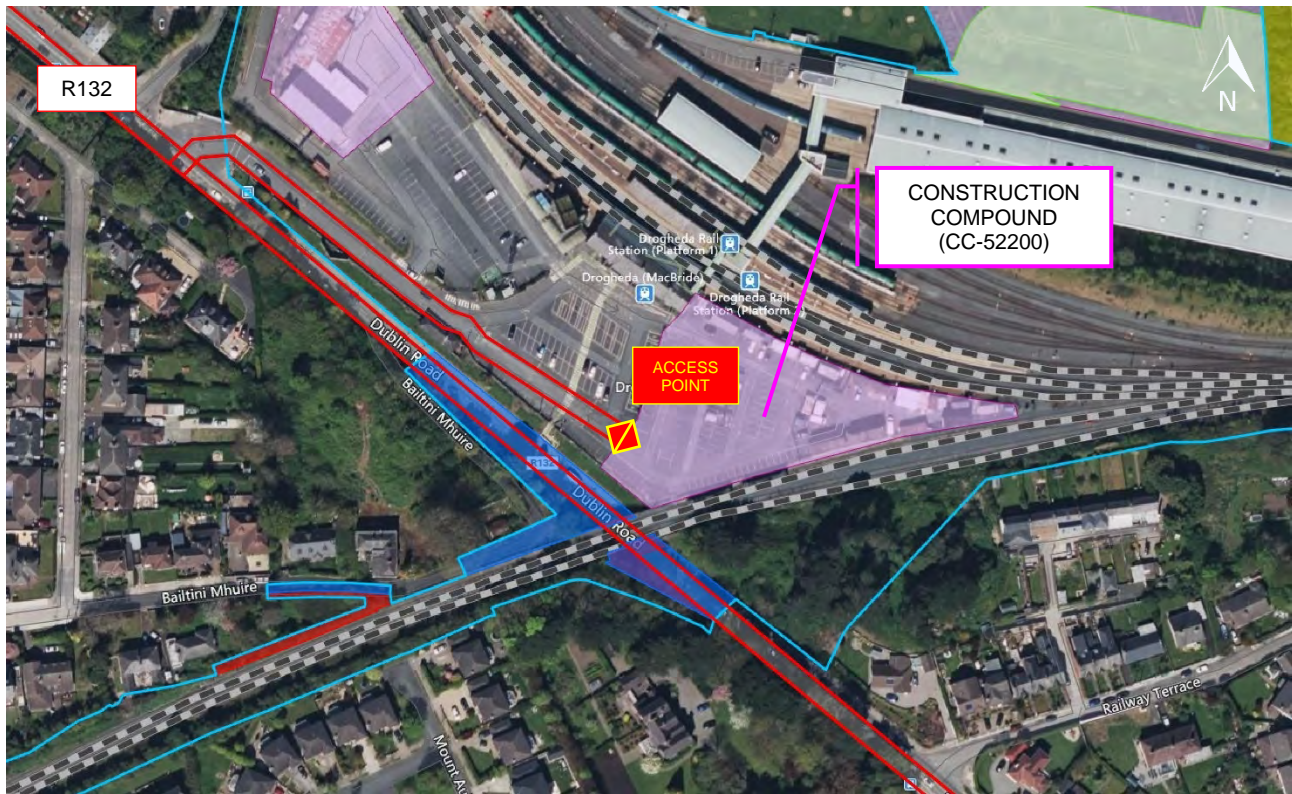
UBK01/OBB81/Platform 4 – Proposed Construction Compound and Access Routes (Source:ESRI)
